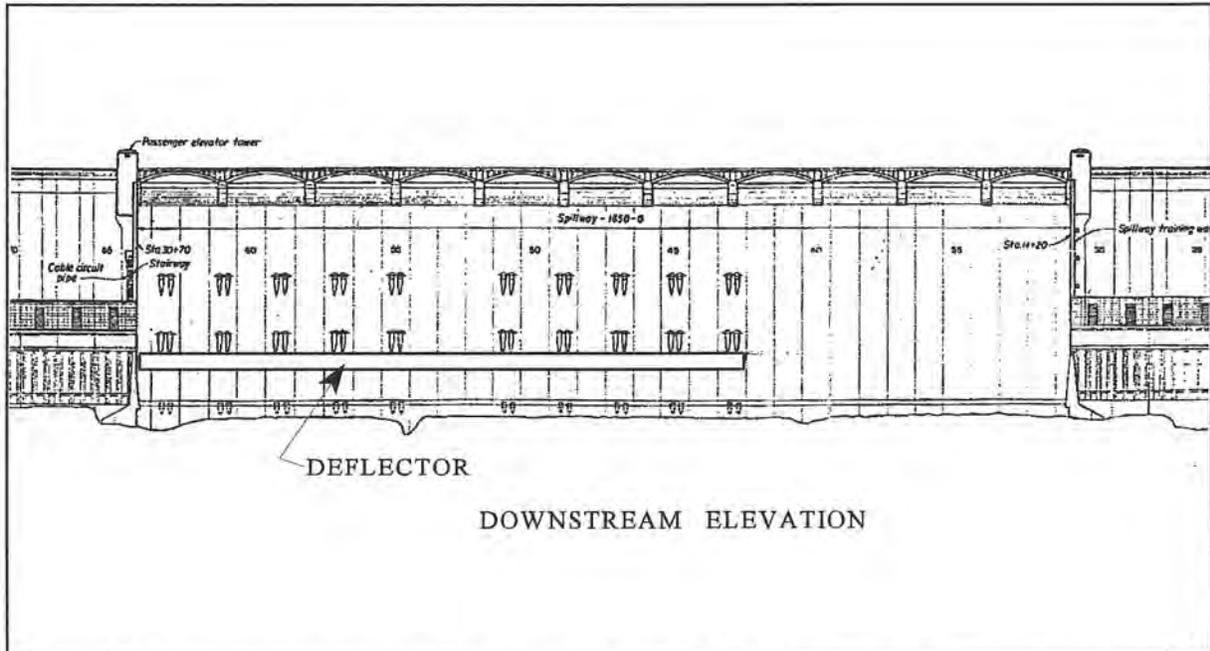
Downstream elevation of the 12.5- by 12.5-ft deflector block on the dam face for alternative No. 4b. (fn:alter#4b1.wpg)
